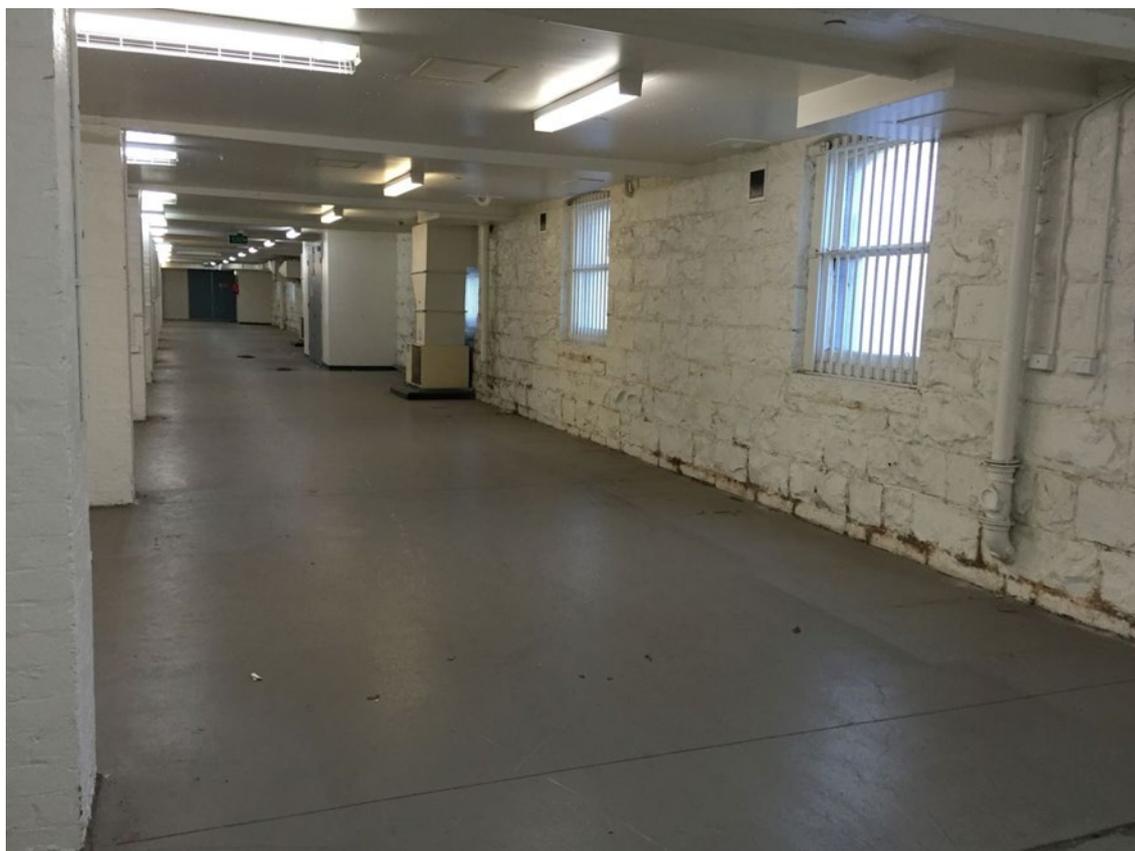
Interior view of basement (c. 2016) prior to recent works, note the painted interior to the bluestone basement walls and modern ceiling
